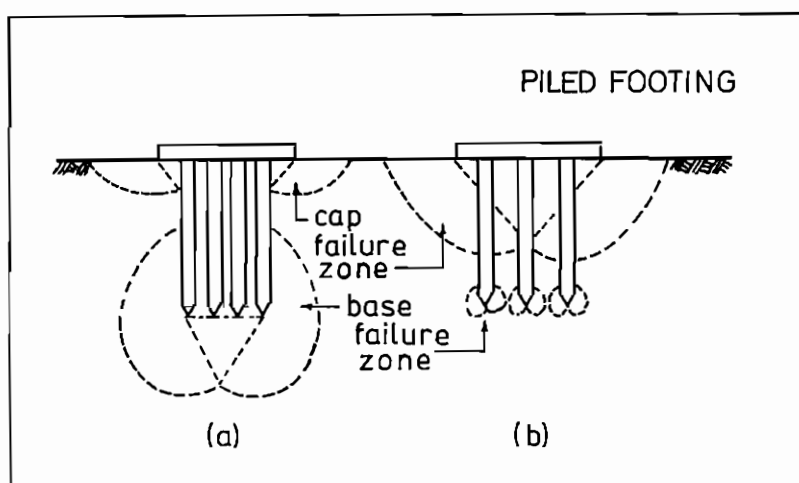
Assumed failure zone at piled footings: (a) pier failure, (b) individual pile failure. (Kishida & Meyerhof, 1965)
